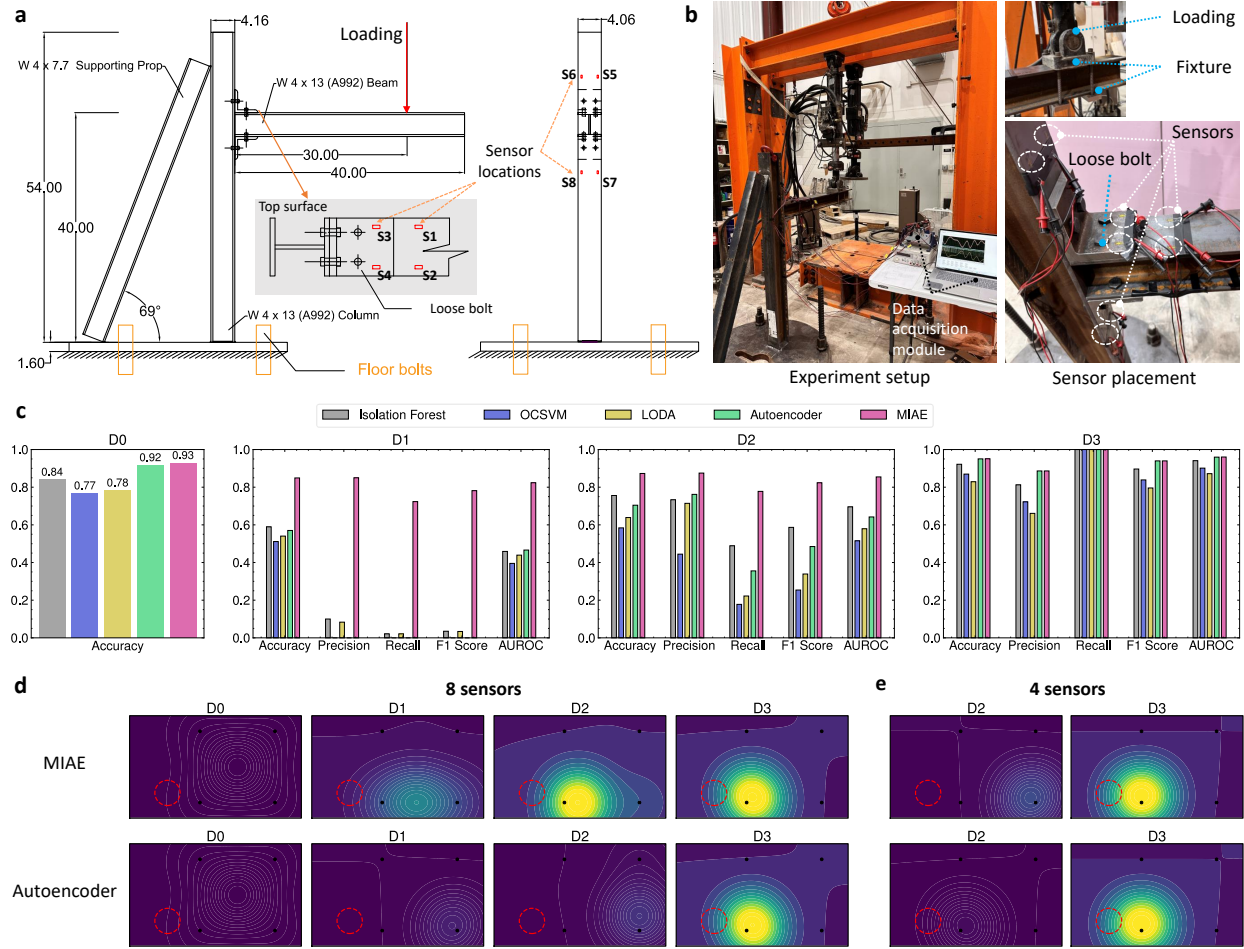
Laboratory experiment on beam-column structure. a. The design specifications. b. The experimental setup, sensor placement, and loading details. c. The damage detection performance at different levels of damage. d. Damage localization using all eight sensors' data for training. Only four sensors on the beam and support are used to generate the localization map. e. Damage localization with only four sensors on the support and beam for training and evaluation. Overall, MIAE can detect and localize small damage, achieving the best performance among all comparisons to the baselines.
